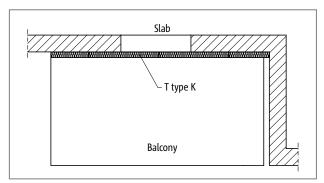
Schöck Isokorb® T type K: Balcony with facade offset
